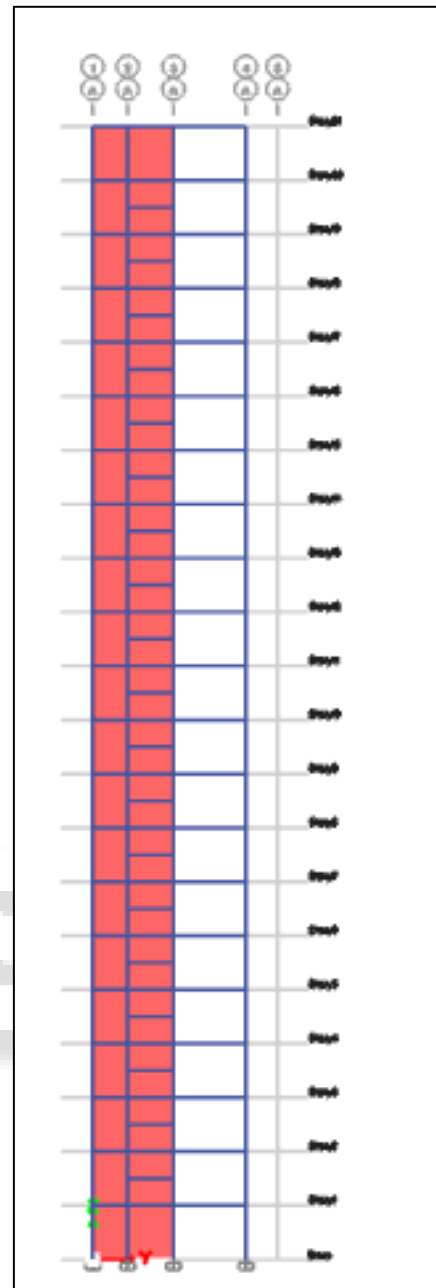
G+20 Residential Building Model with Shear Wall, left elevation view
